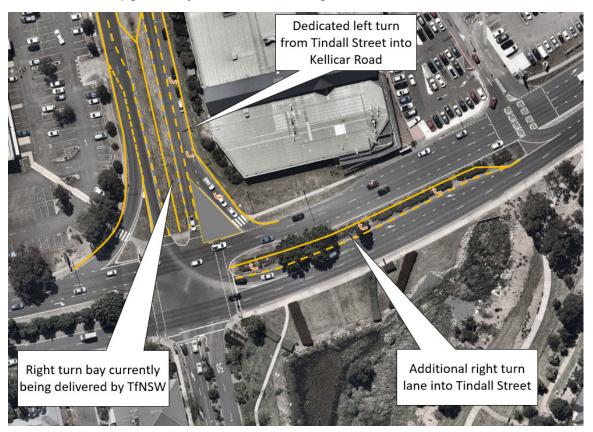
Proposed mitigation at Kellicar Road / Tindall Street intersection
